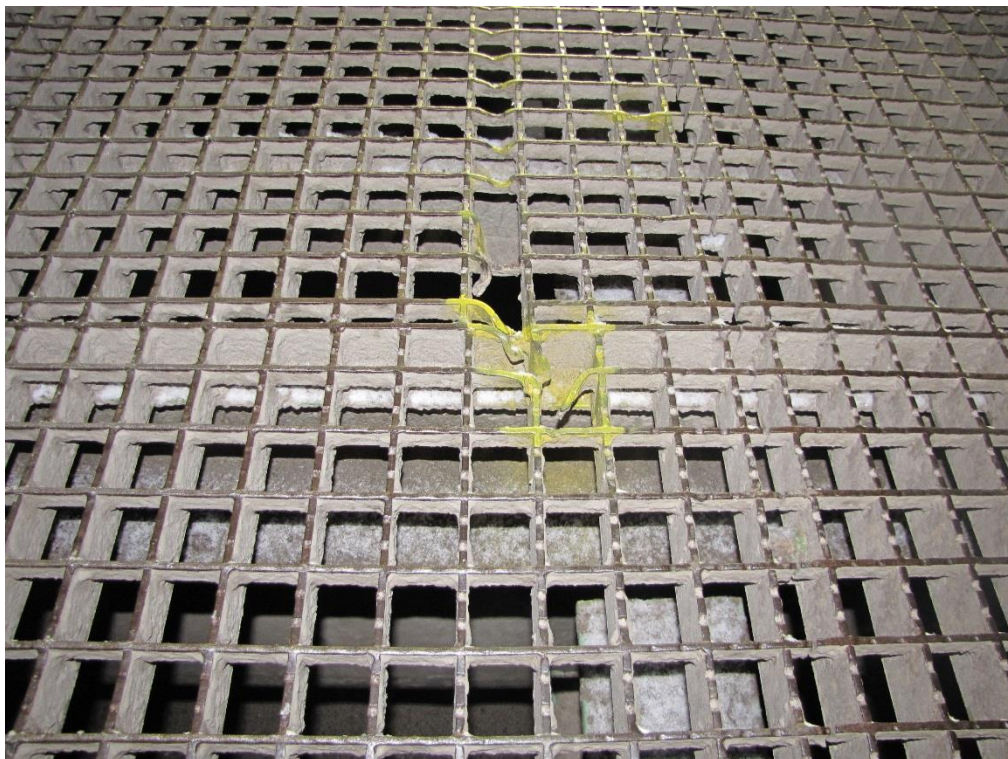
Broken and Bent Transverse Cross-Bars (12-14 at 1-13)
